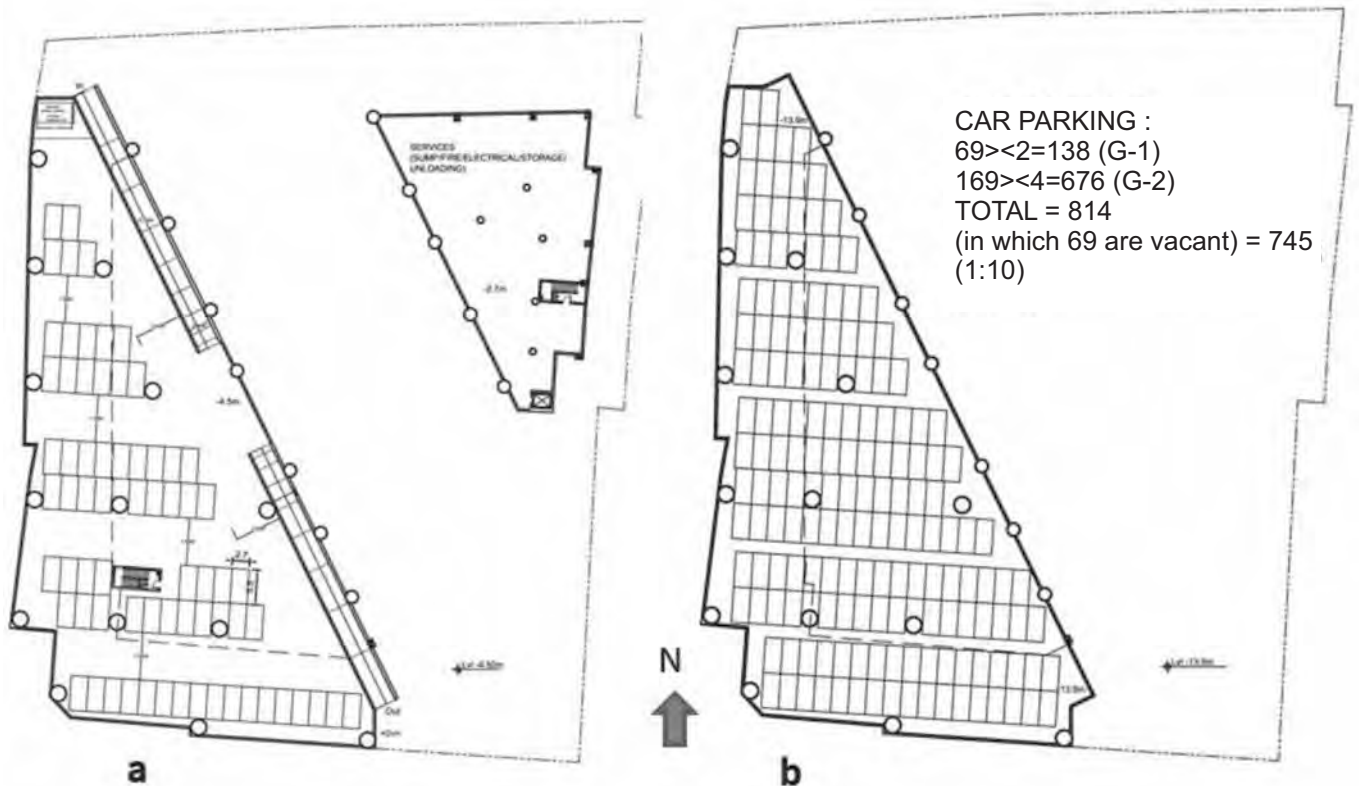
Basement Floor Plan. (a) G-1 Parking, (b) G-2 Stack Parking
